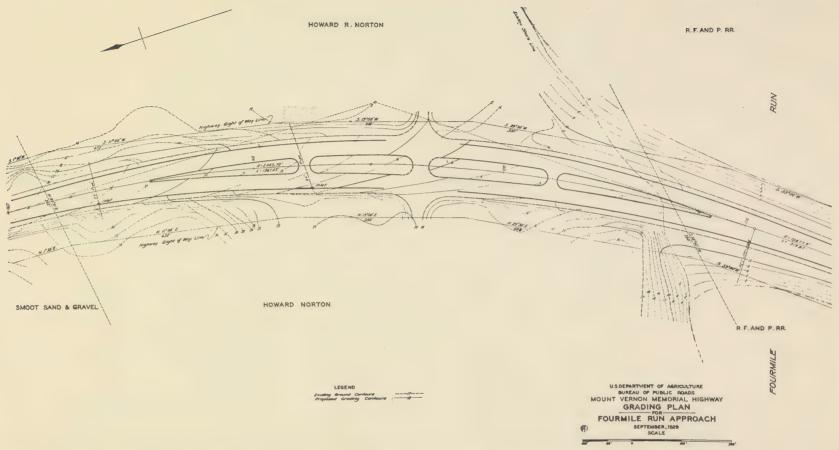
Provision for turning around and also for a small amount of cross traffic at grade has been made on curves where the roadway can be widened to permit the placing of islands of sufficient width. Pleasing and easy-flowing alignment is obtained, and also a safe means of surface crossing. On a heavily traveled 4-lane highway it is almost impossible at times to get sufficient break in traffic to permit crossing at grade. Divided roadways, separated by islands, facilitate crossing at grade by permitting it to be done in two operations. A break in the traffic flowing in one direction permits a crossing to the island, and the crossing is completed at the first break in traffic flowing in the opposite direction. Even on heavily traveled roads, crossings of this character may be accomplished in the space of a few minutes. An extra traffic lane is provided on all divided roadways, so that the inside traffic lane may be used by vehicles desiring to turn
